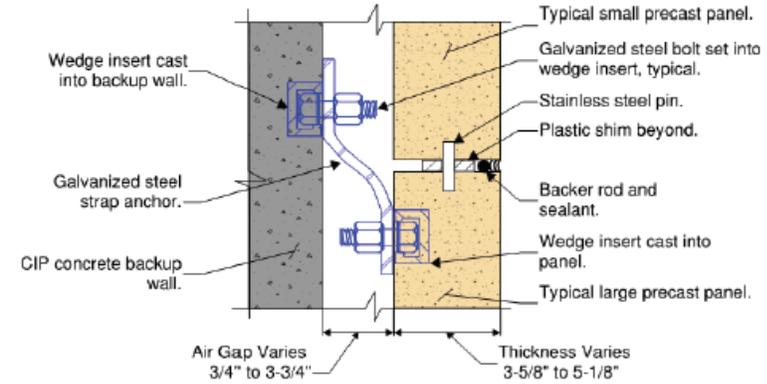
SECTION DETAIL - STRAP ANCHOR / TYPICAL
